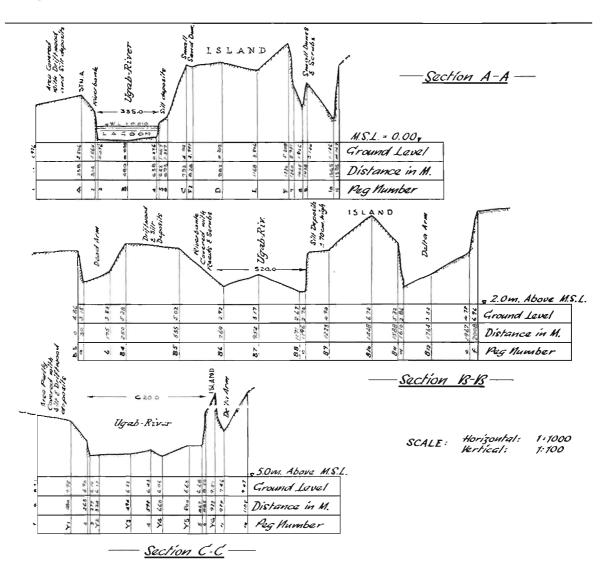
Ugab. -- Cross sections A, B and C (Ugab River Mouth Survey, April 1964).
